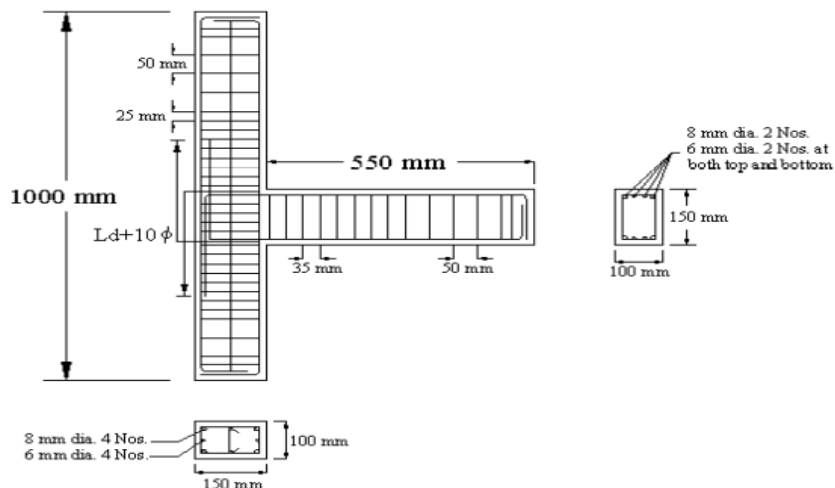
Reinforcement details of the exterior beam column joint as per IS 13920 (BIS, 1993)
